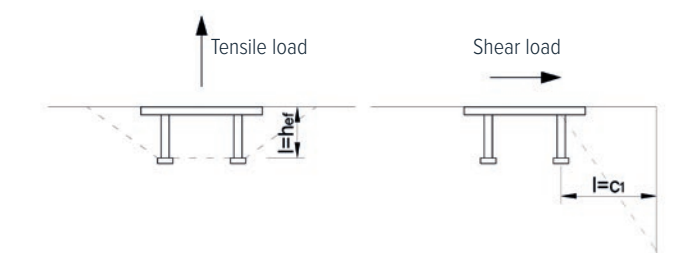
Examples of concrete failure under a) Tensile b) Shear load.
